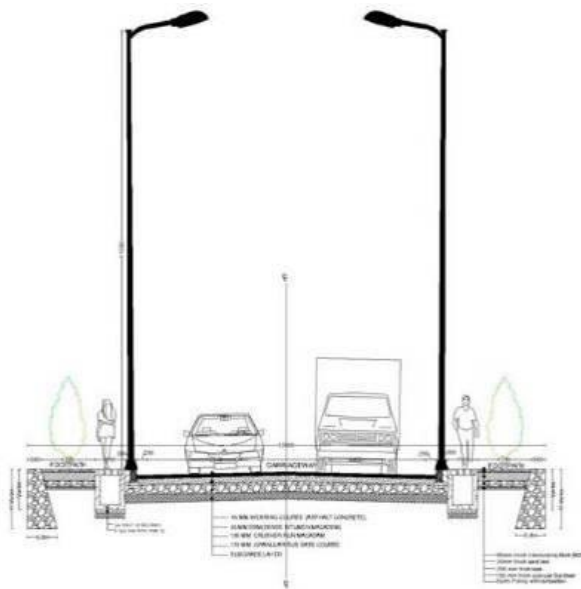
Typical Cross Section for 13m road (section Type C)
